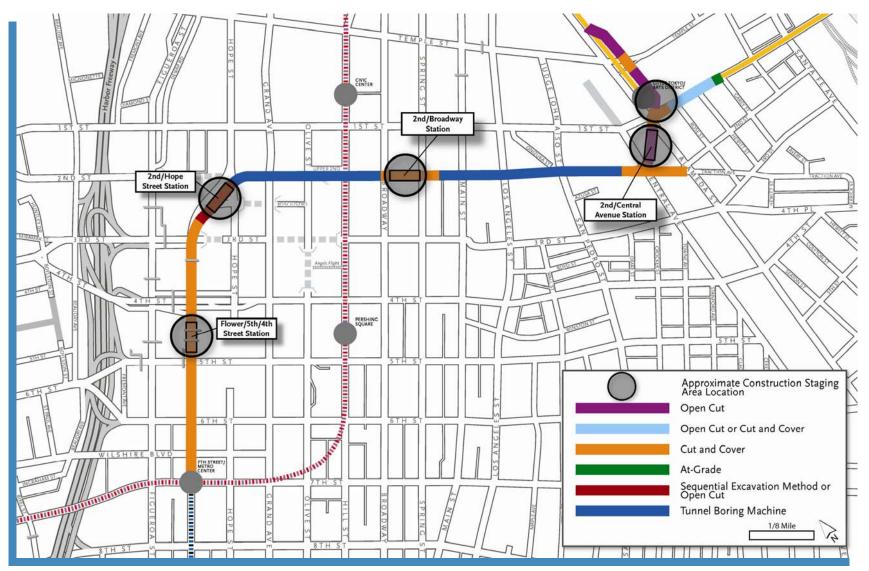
Fully Underground LRT Alternative Construction Areas and Methods
